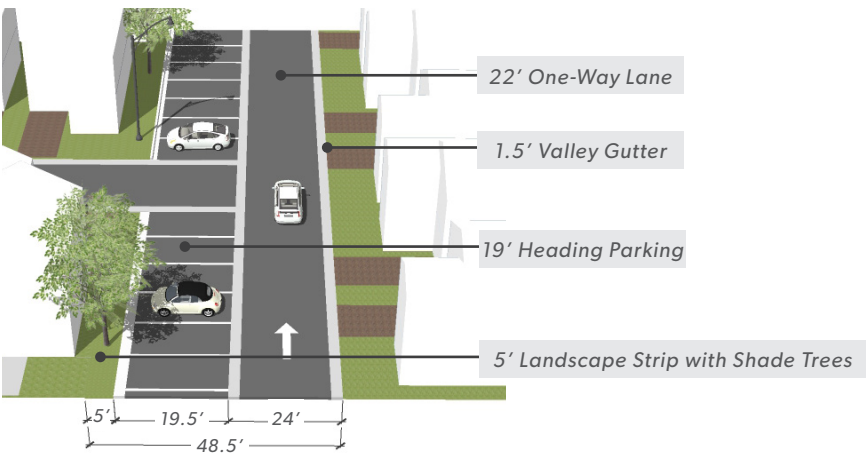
ALLEY TYPE "A" TYPICAL SECTION
